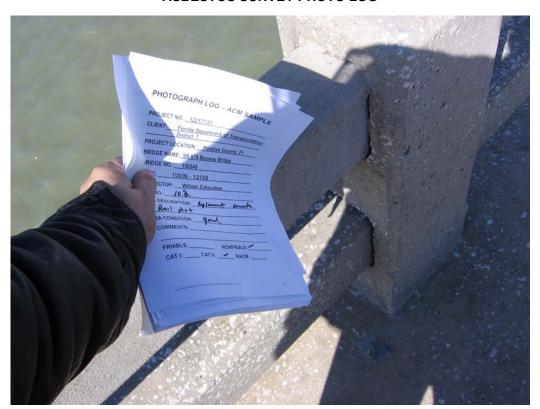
01/21/09 – SAMPLE 10.2 – HA 10 CONCRETE REPLACEMENT RAIL POSTS
